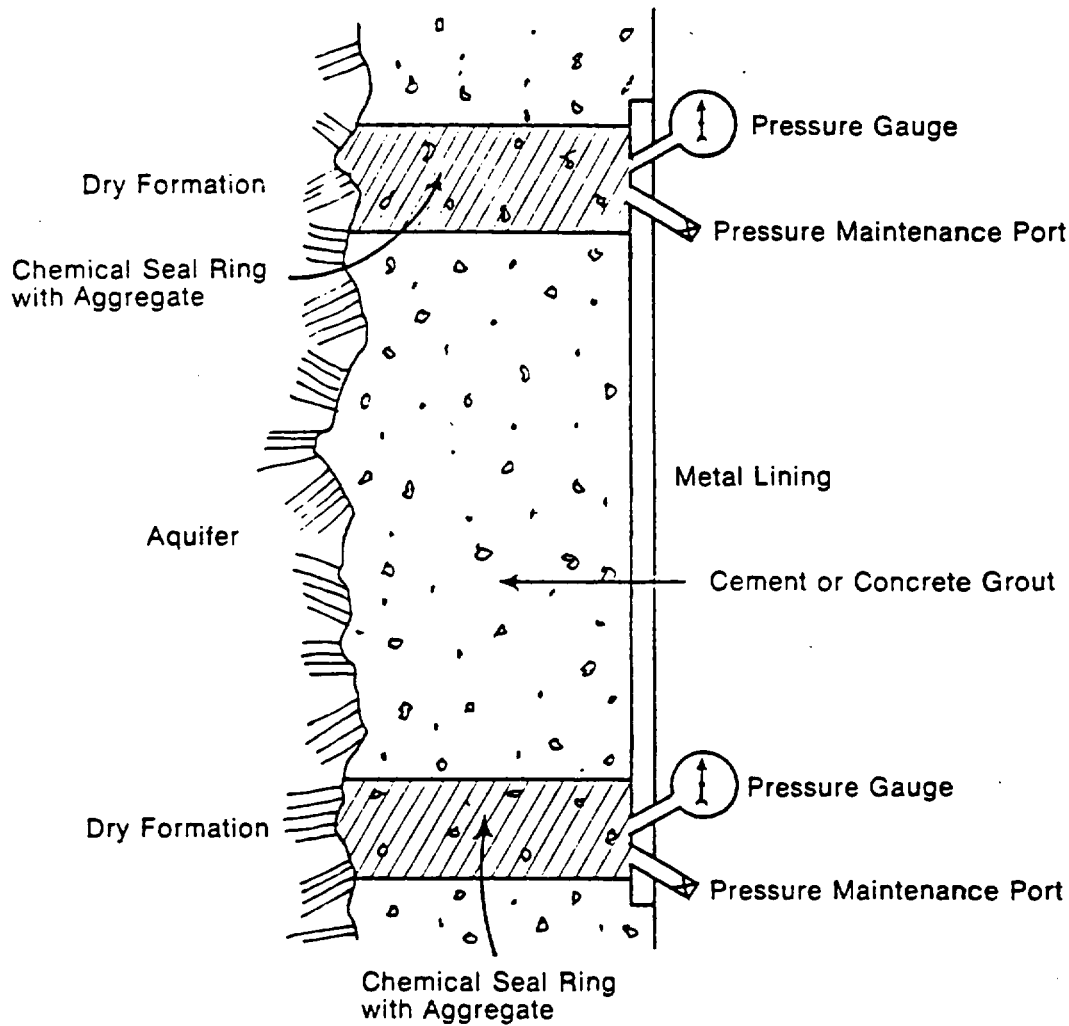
Schematic drawing of a seal assembly in a sunken shaft.
